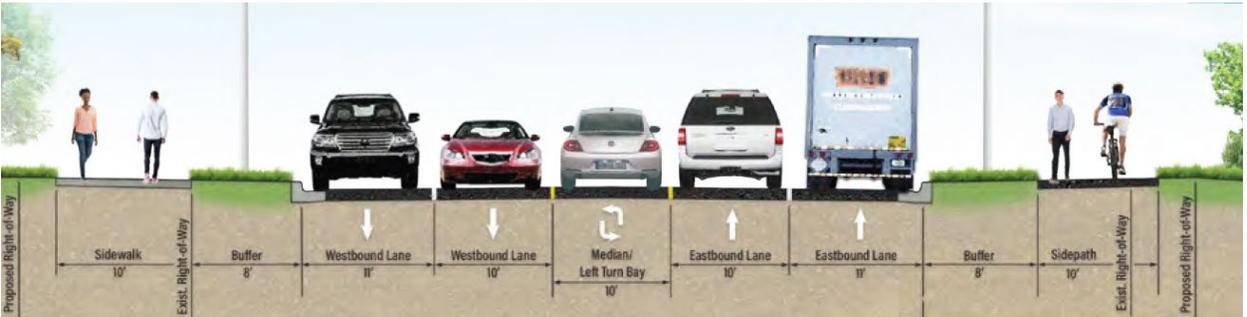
Alternative 4 – Prosperity Drive Typical Cross Section
